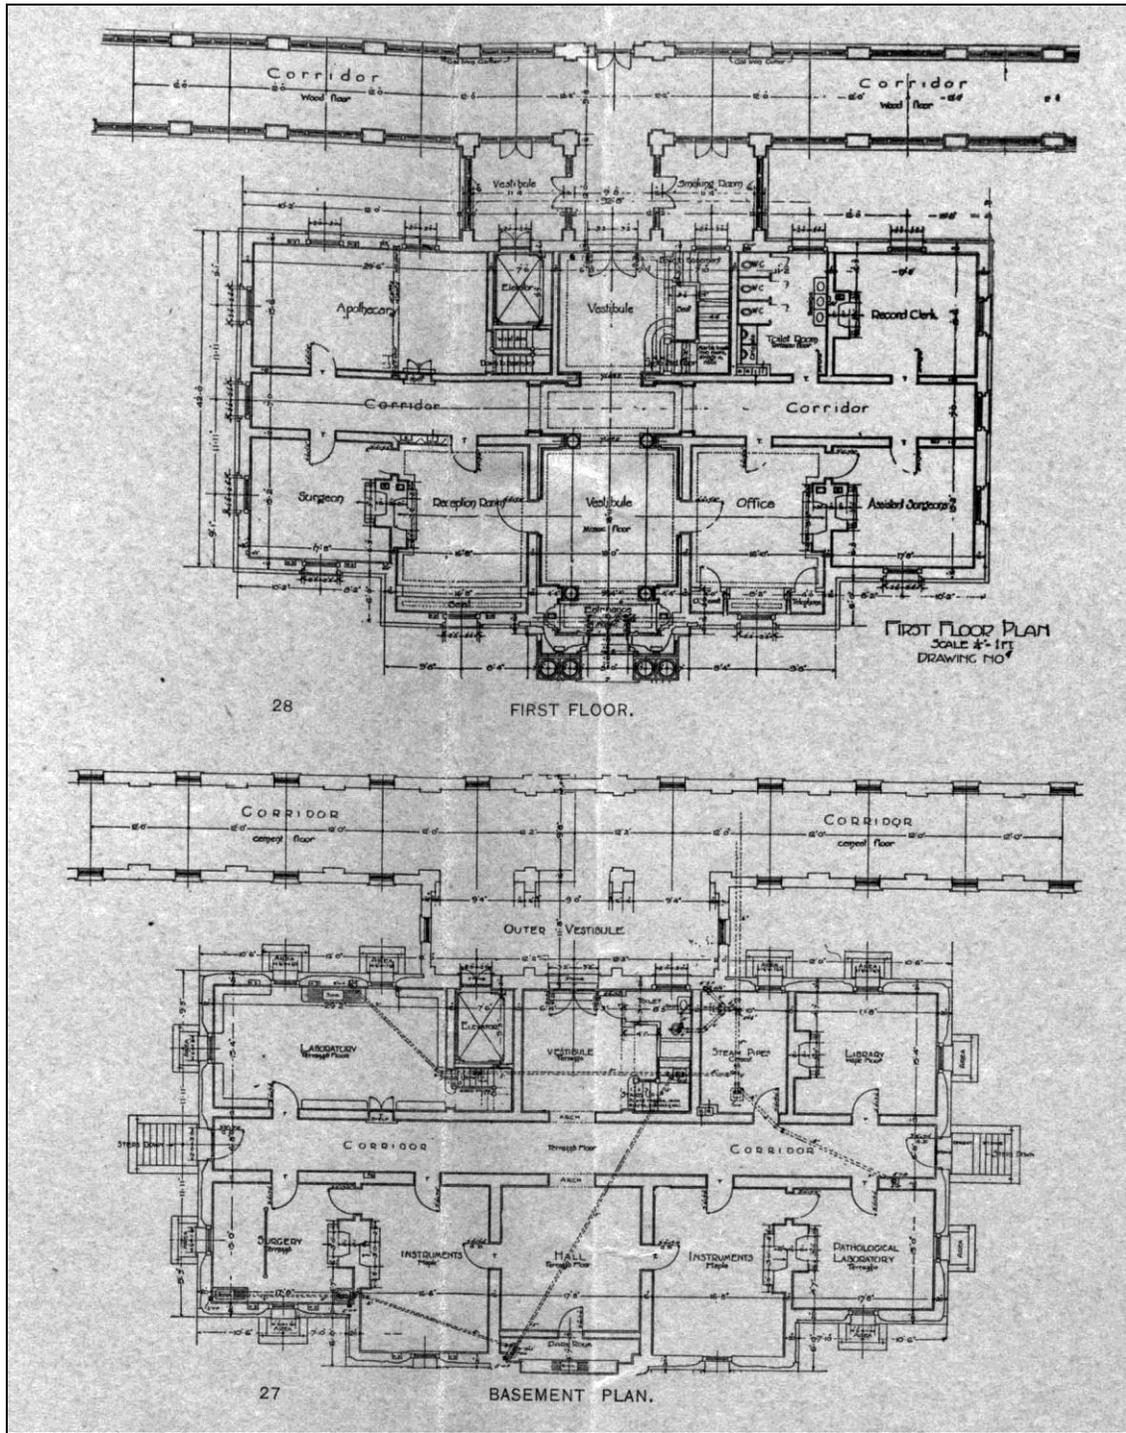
Basement and First Floor Plans, Mountain Branch Hospital Administration Building
